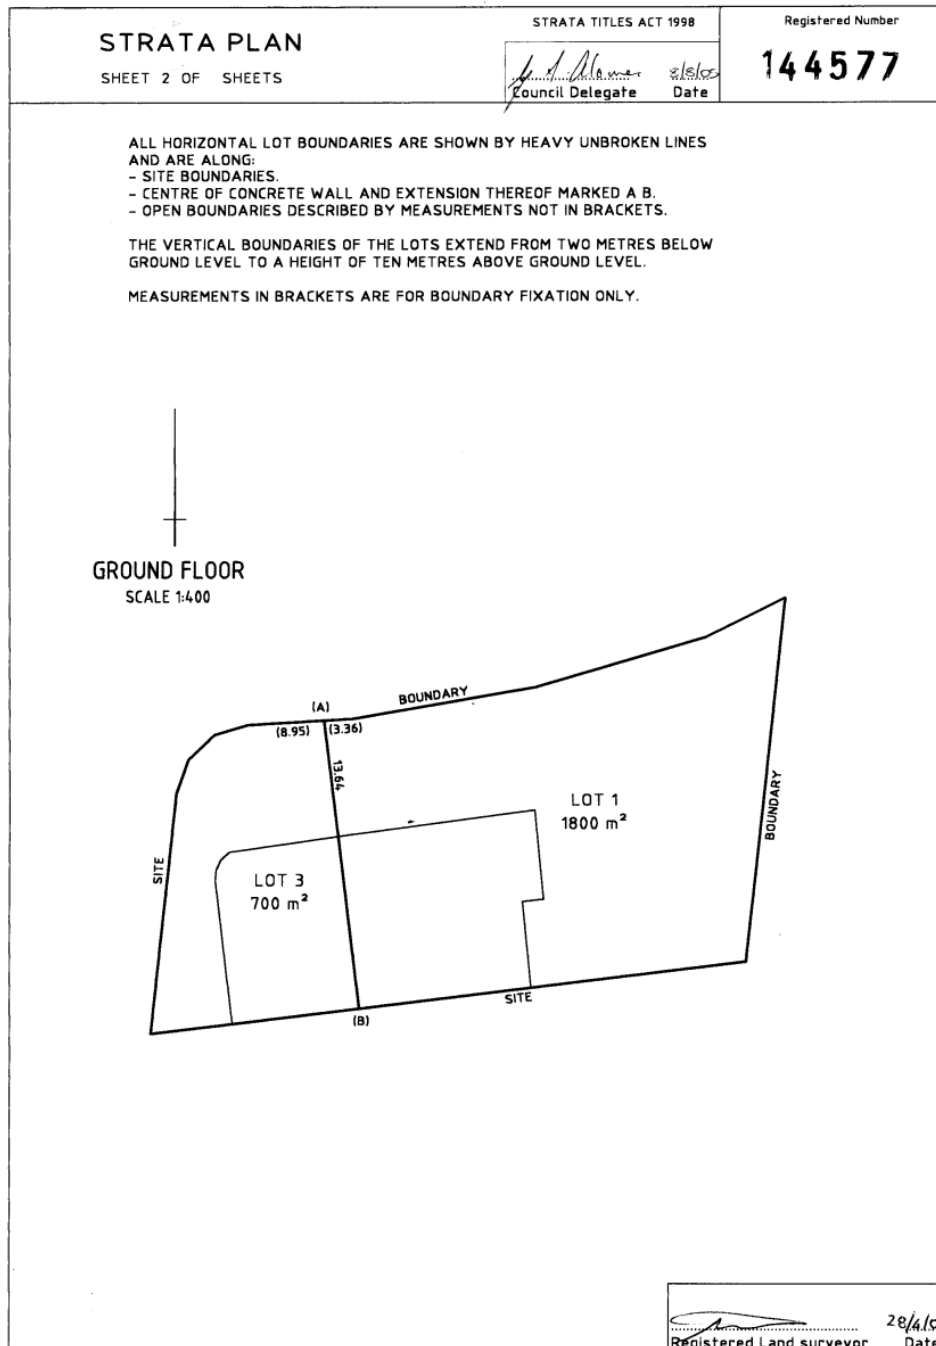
Strata title plan for strata scheme 144577. The subject site at 1 Ascot Drive is lot 3 on the plan. Source: theLIST, March 2024. Not to nominated scale.
